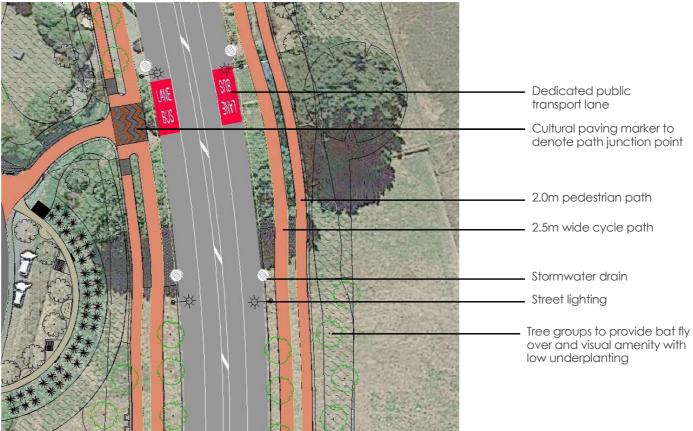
PLAN VIEW EXTRACT OF THE RING ROAD EXTENSION
